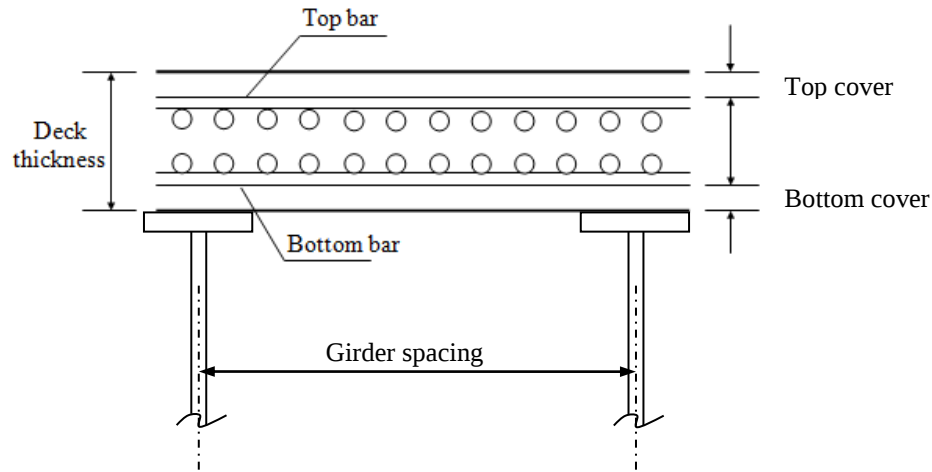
Schematic diagram of deck slab reinforcements in a transverse section
